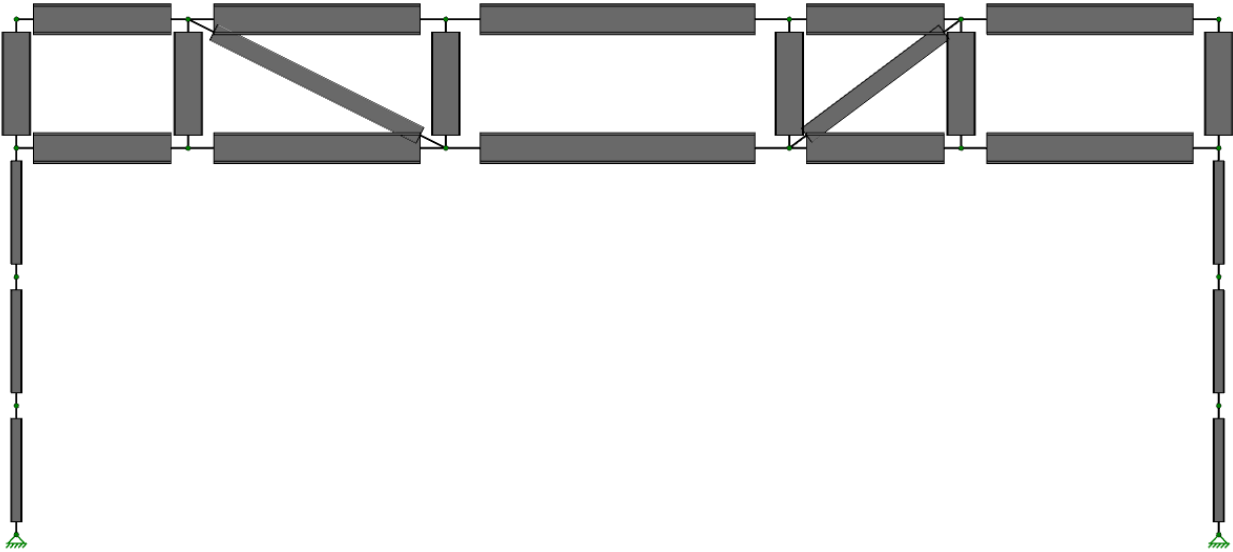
Row 9 Frame with Supporting Columns to the 1st Floor. Final Column Size was W14x193, and each was 15 feet tall ($L_c=15$ feet)
